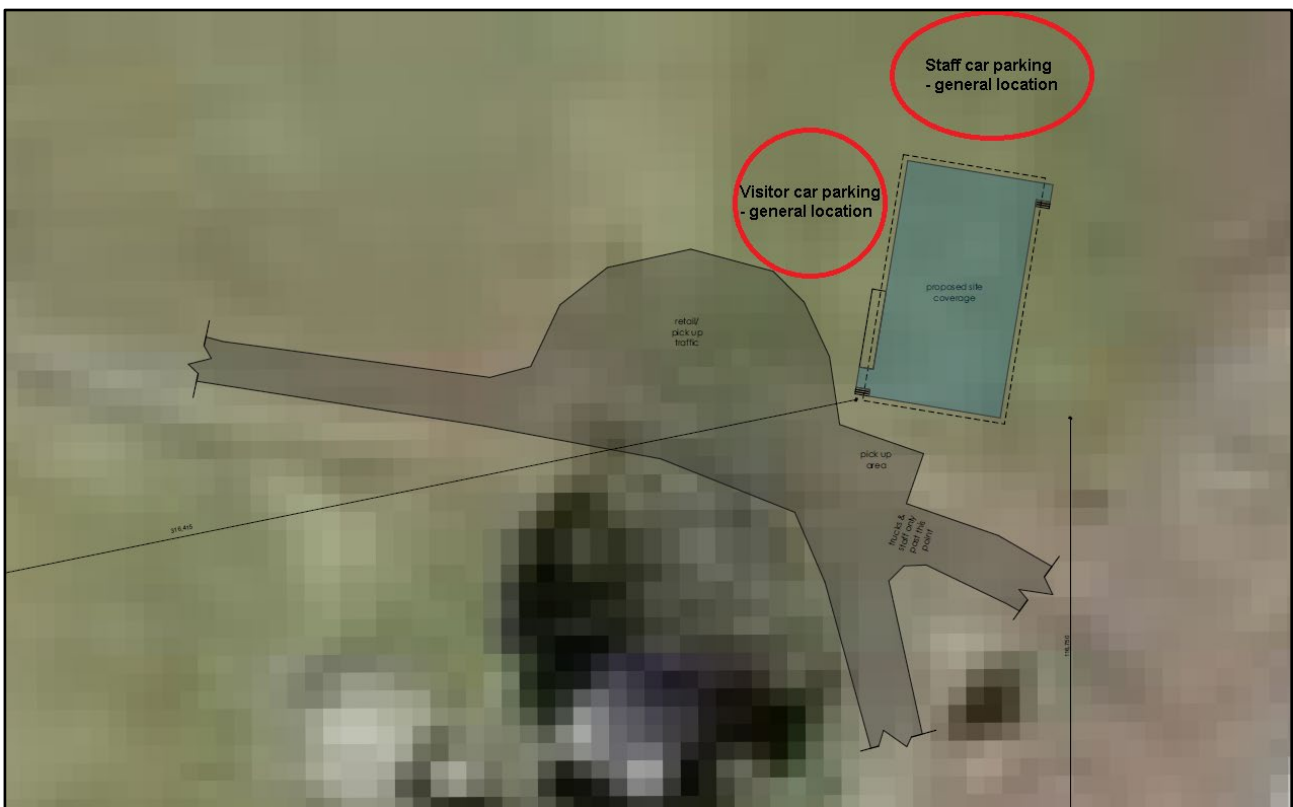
Car parking general locations – Extract from Site Plan by Cyber Drafting & Design
